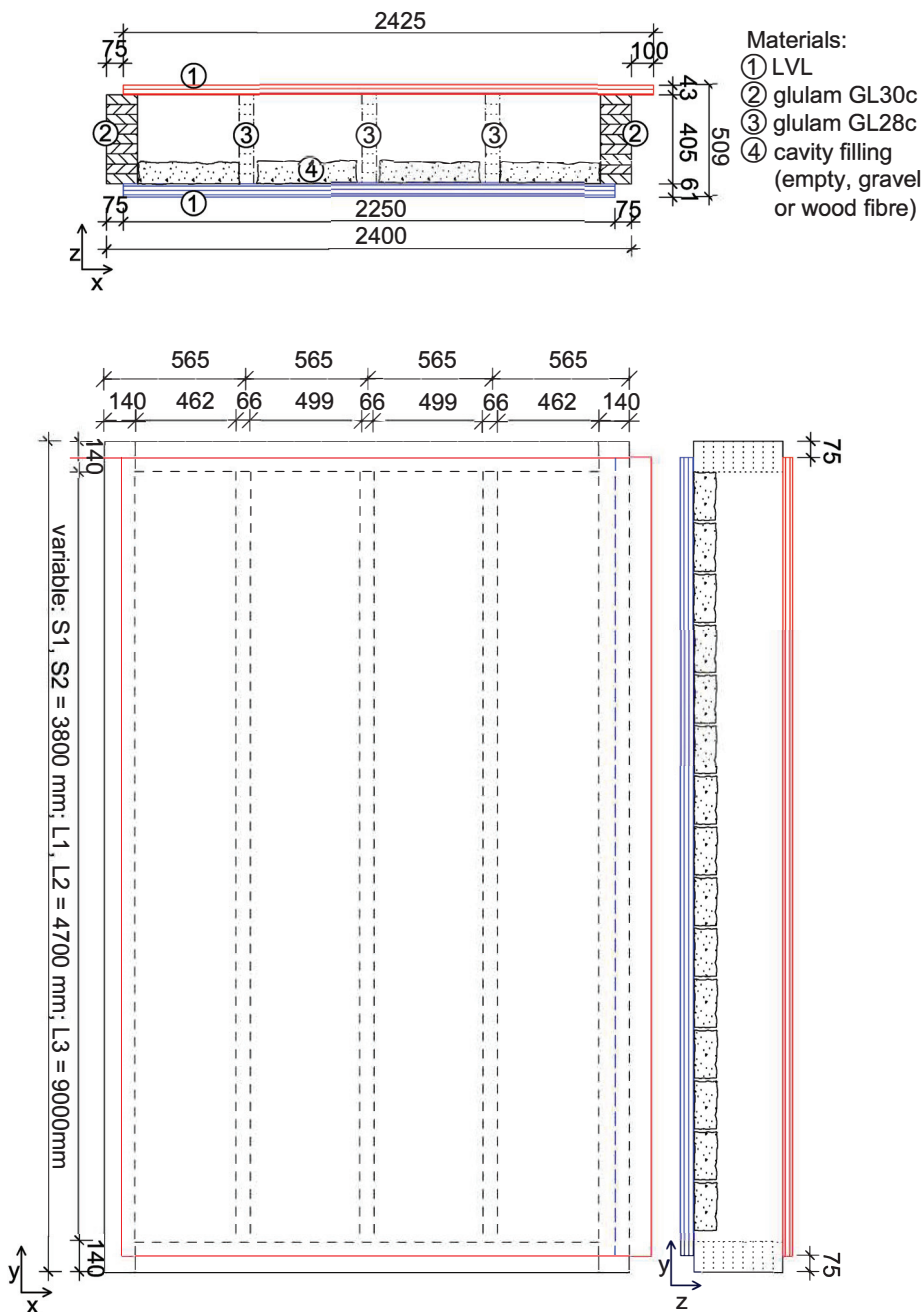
Geometry of the Woodsol hollow-box floor element. All dimensions are given in mm. Adapted from [7].
